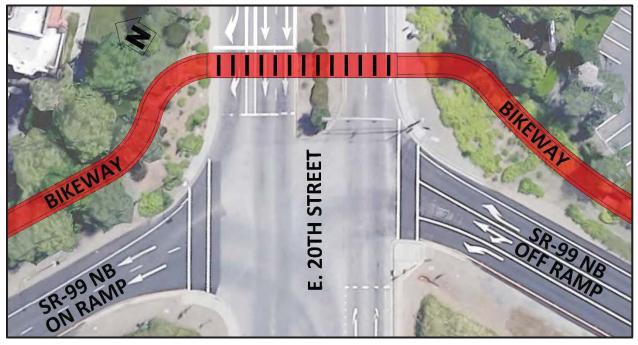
PROPOSED AT-GRADE CROSSING ALTERNATIVE 1 AT 20TH STREET AND SR-99 RAMPS
